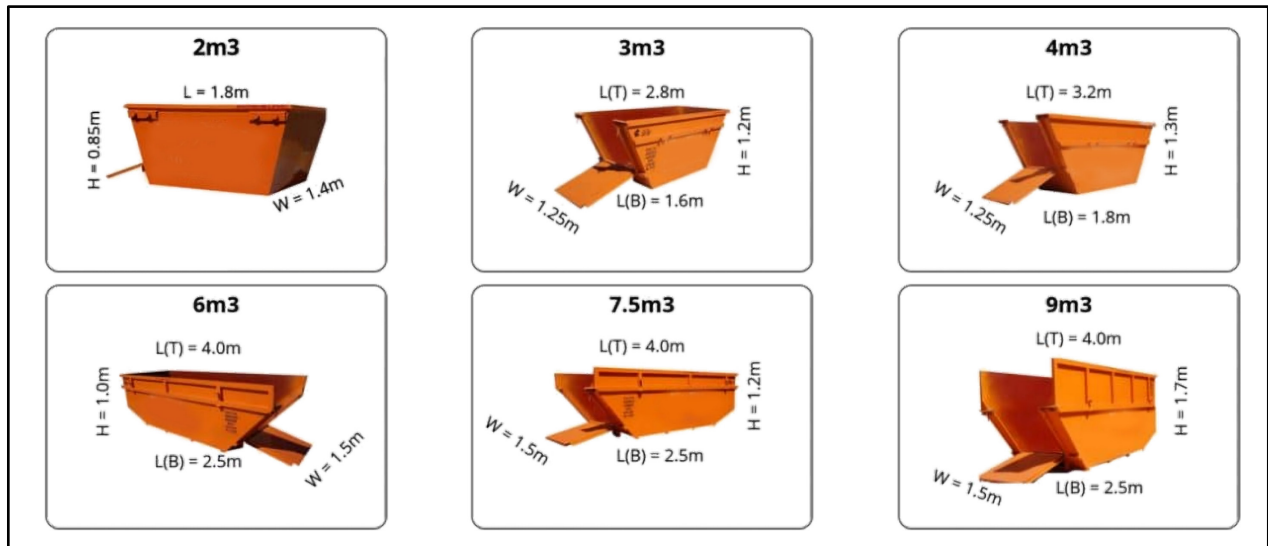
Typical Waste Skips for Demolition & Construction Site Waste Management
